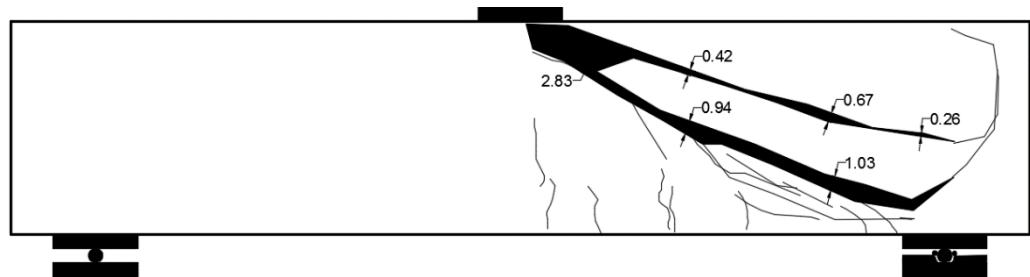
Crack pattern at failure for SNFRC 0.75% beam #15
